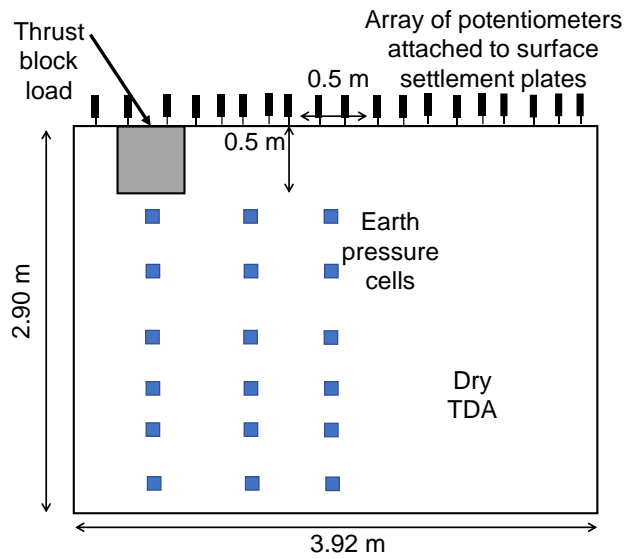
Example of instrumentation layout for inclined loading of footings: Elevation
